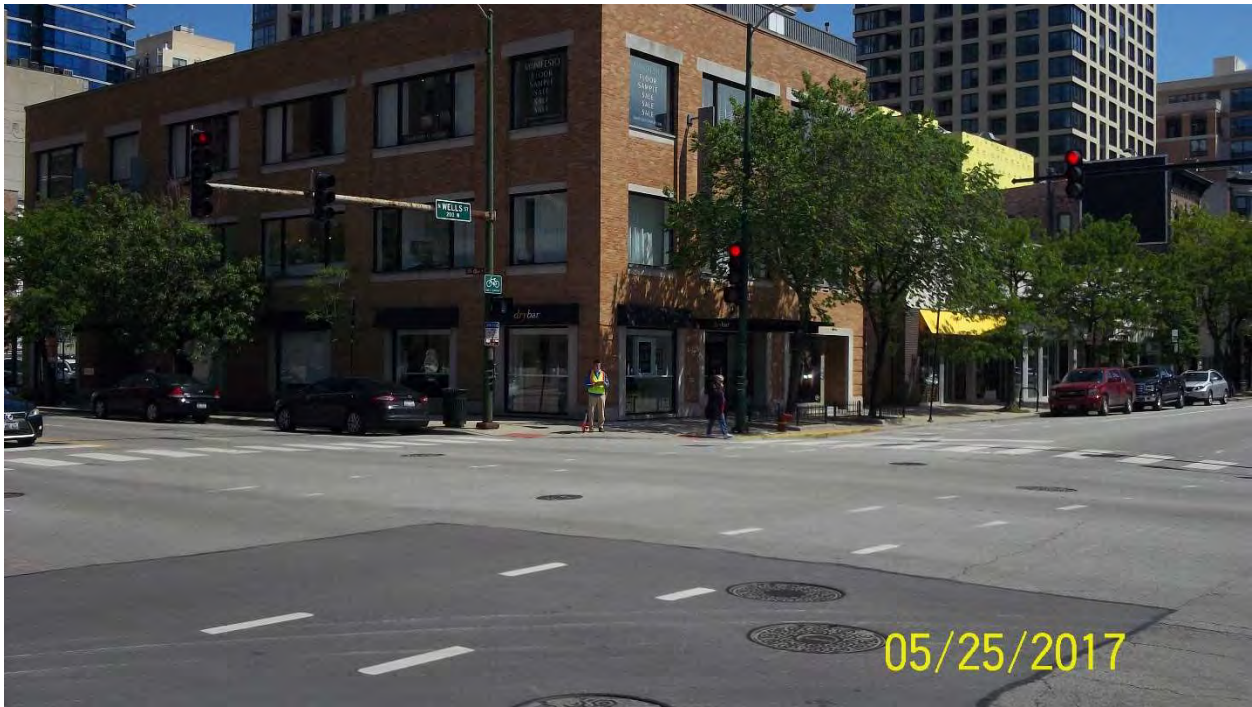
Northwest corner of Chicago Ave. / Wells St. – Looking Southeast
